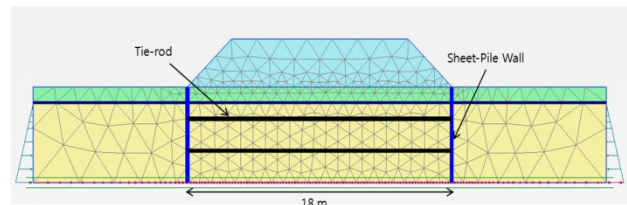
Geometric Layout of the Sheet Pile Enclosure Model
